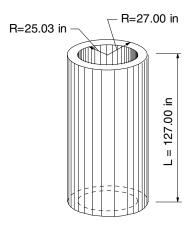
Geometry of the concrete pipe subjected to an external hydrostatic pressure.
